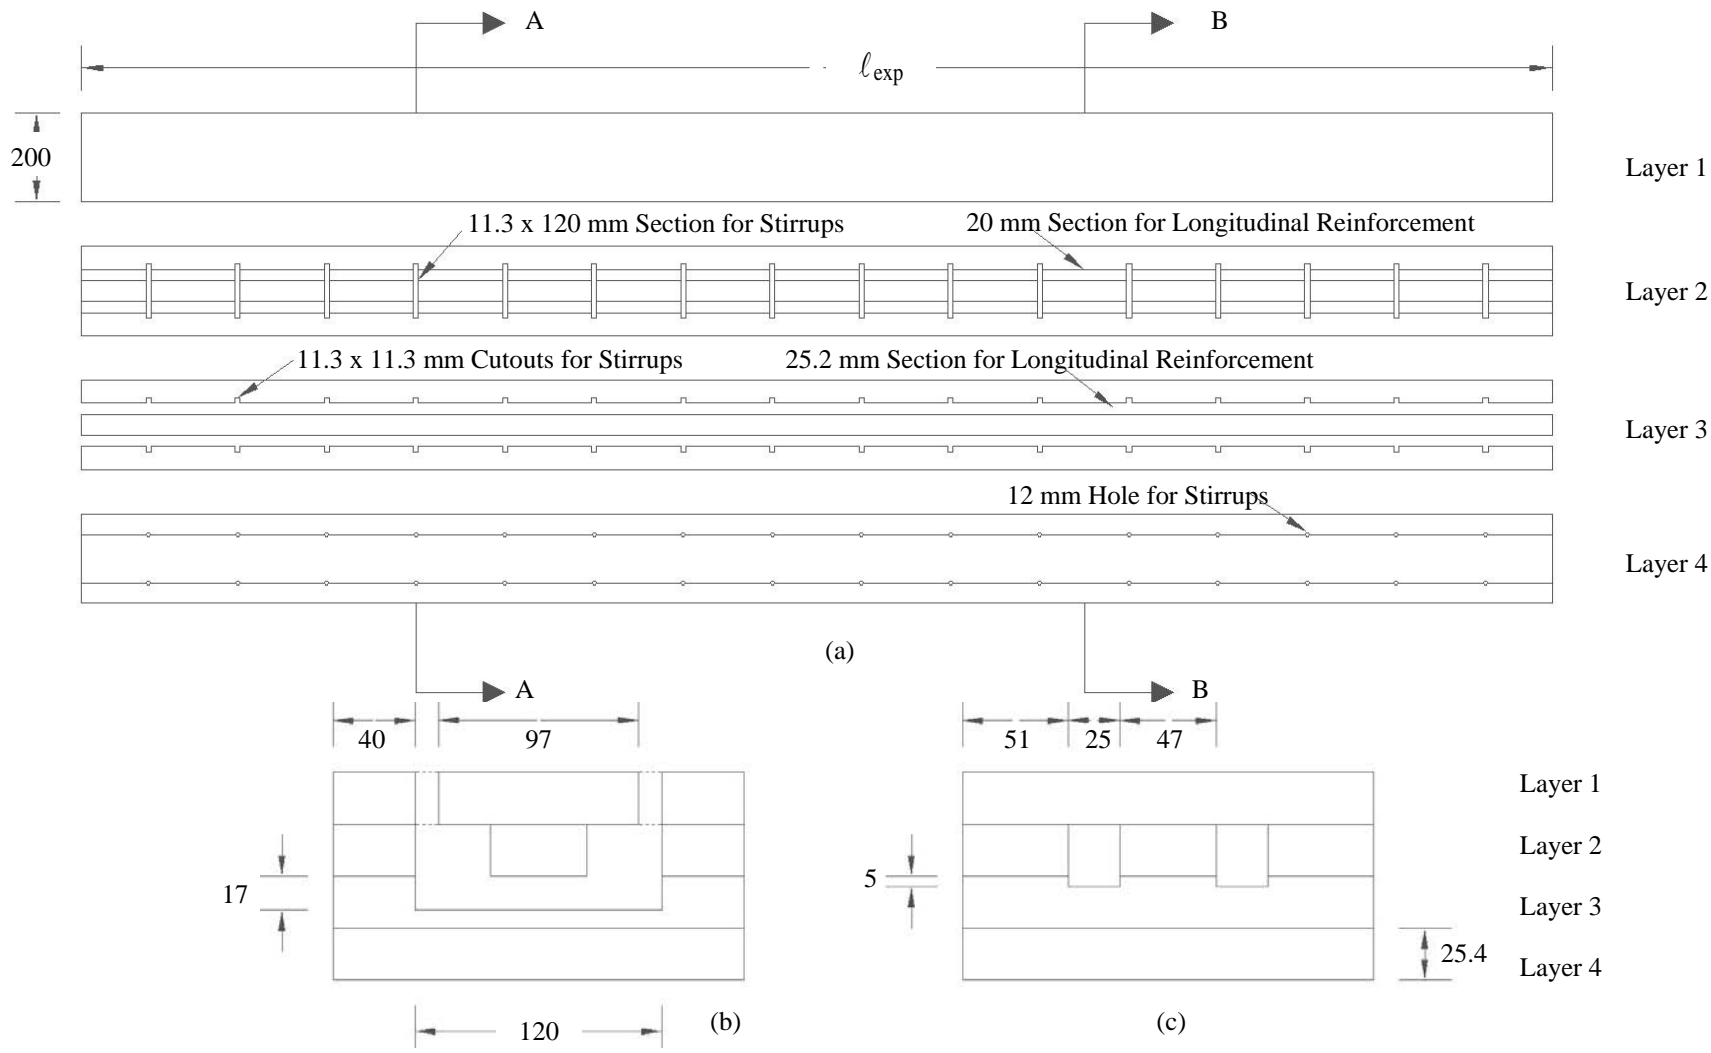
Foam Insulation Void: (a) Plan of Individual Layers, (b) Section A-A at Stirrups, and (c) Section B-B between Stirrups (All Dimensions in mm).
